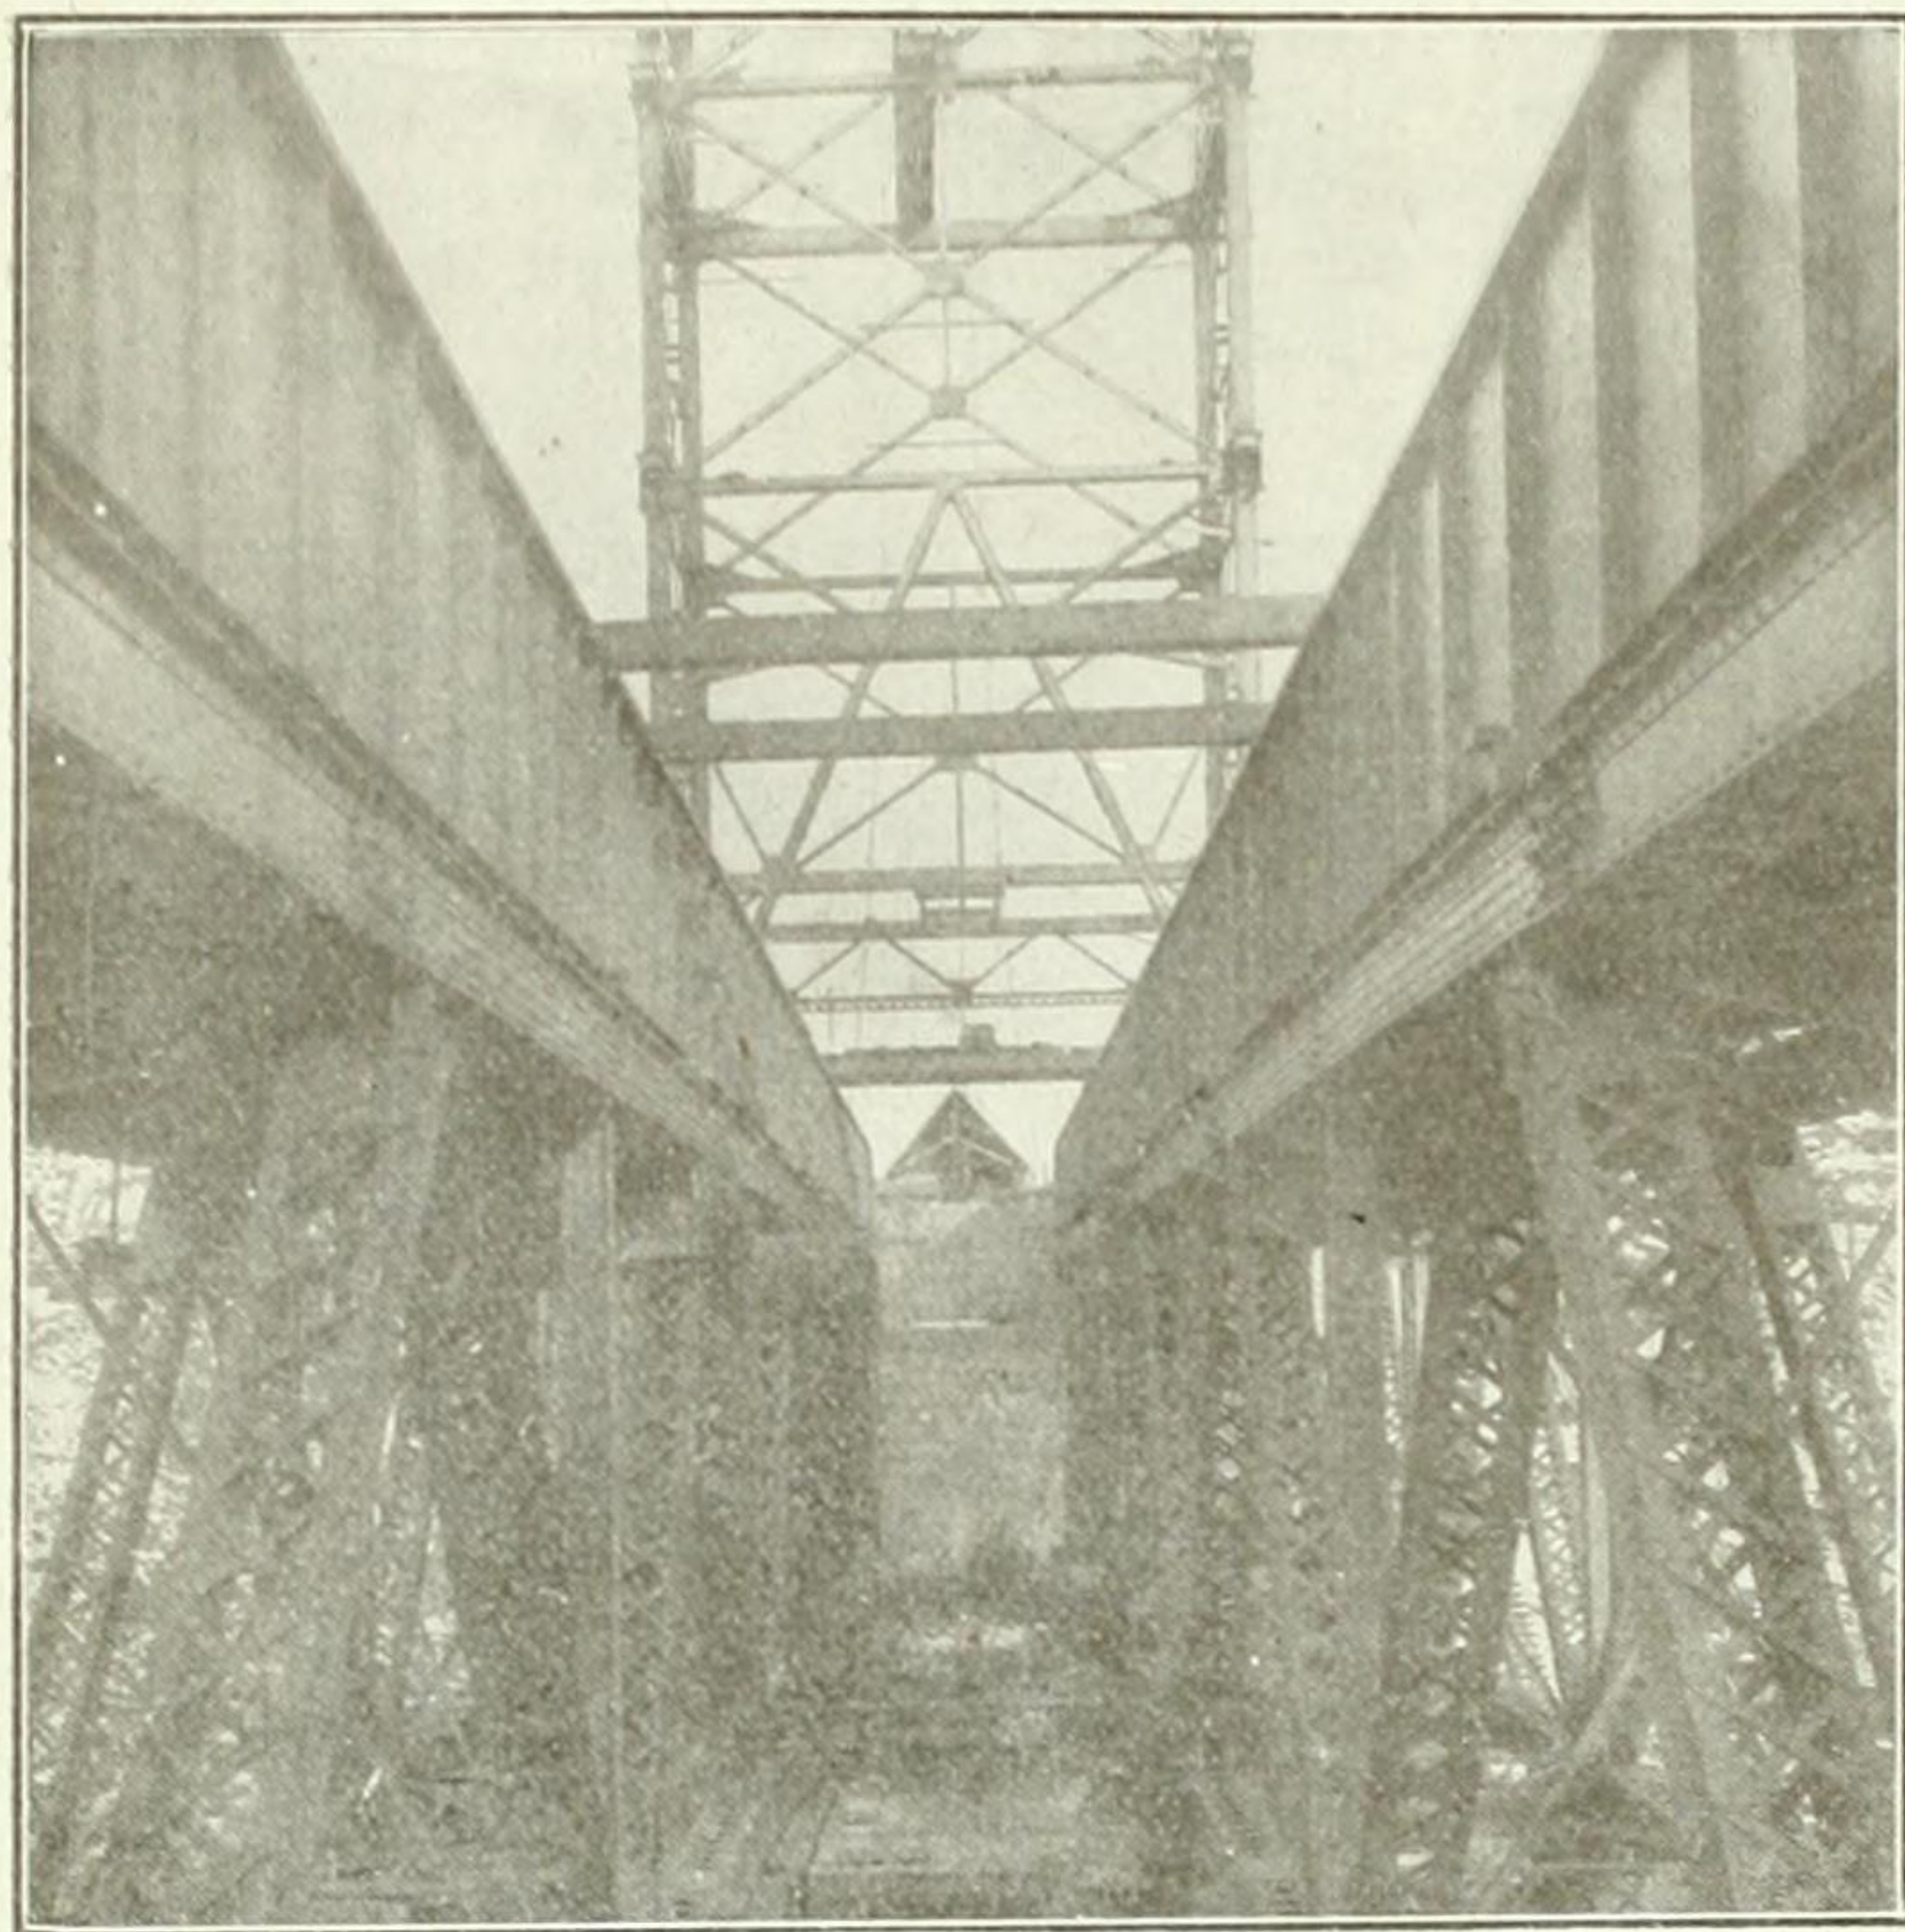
North approach span erected. As the railway tracks on the bridge are 32 ft. centre to centre, these approach spans are erected as two separate bridges, each carrying a track.
